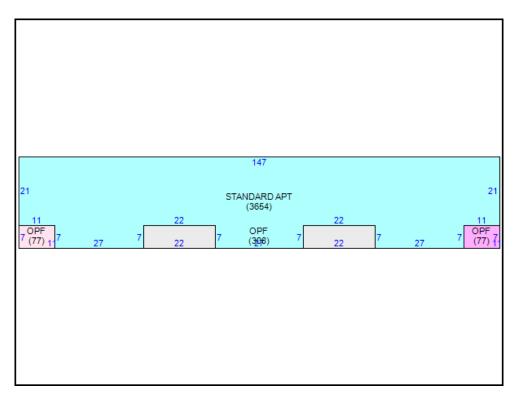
Standard four-unit apartment plan (Leon County Property Appraiser 2020).
